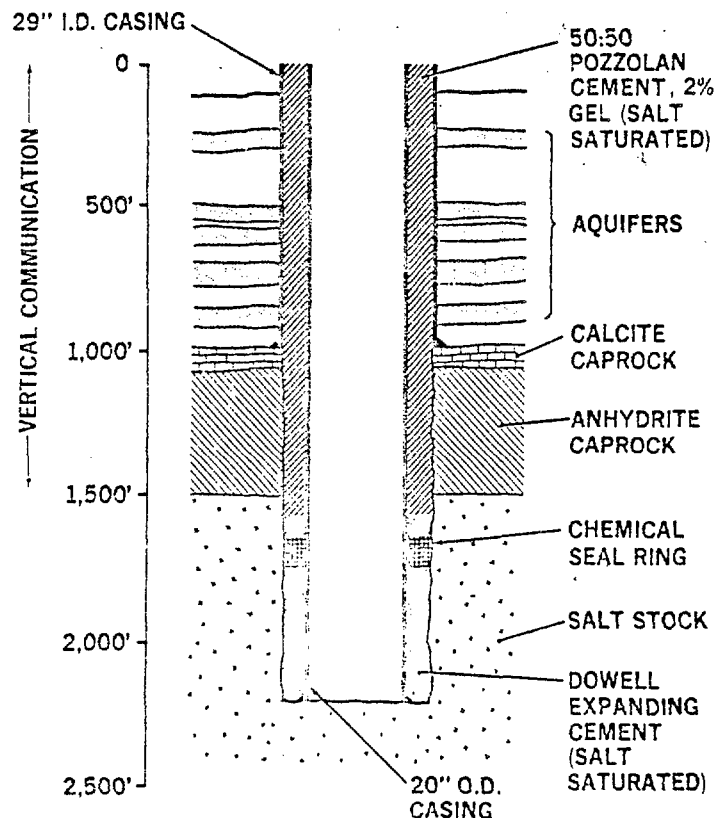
Drawing of placement technique for Dowell Chemical Seal Ring used to seal large-diameter pipe at the Tatum Salt Dome.
